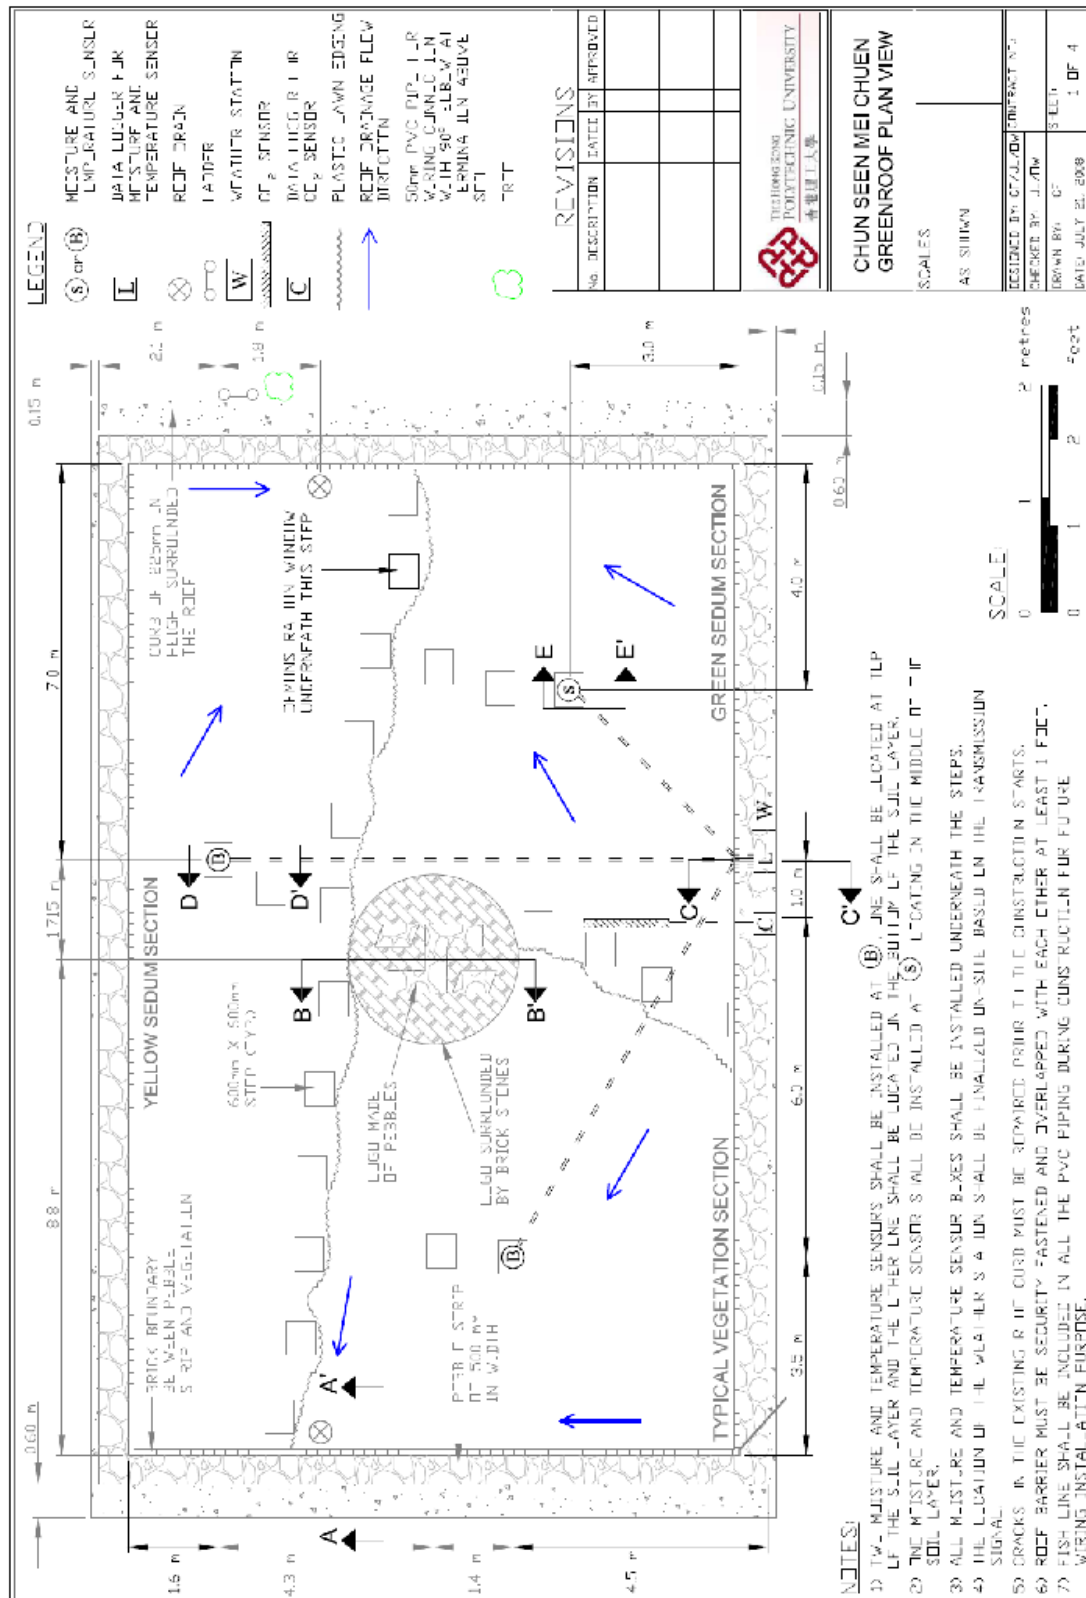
Layout of Monitoring Locations (Li, Wai & Lam, 2009)
